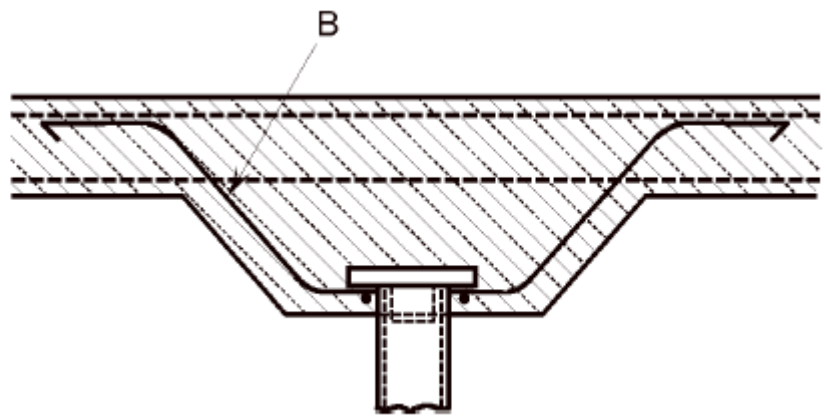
Tubular and box type piles, examples of connections with the pile cap
